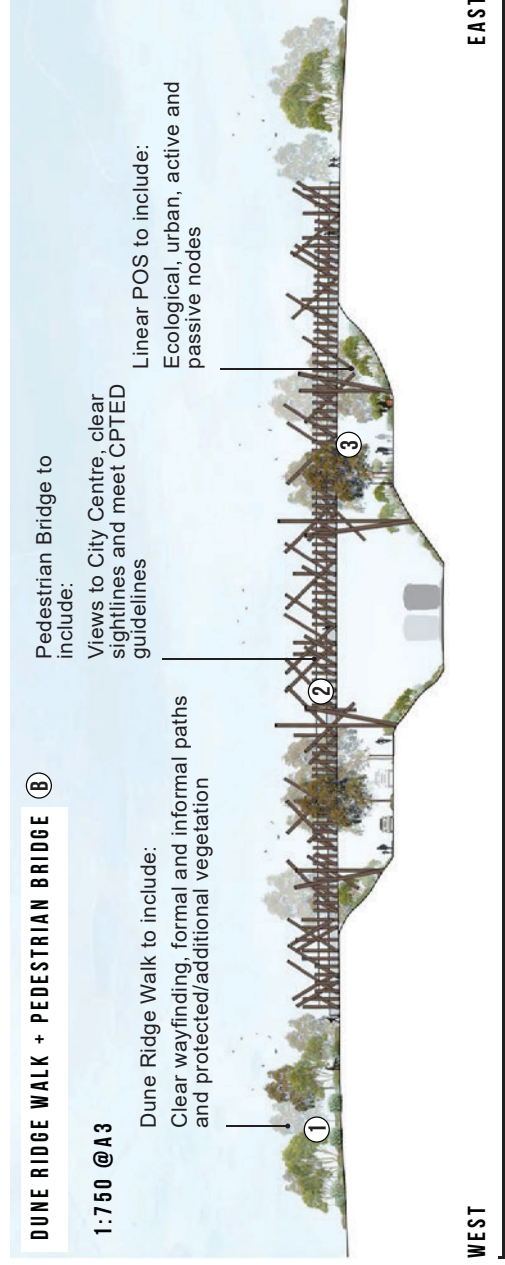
Dune Ridge Walk and Pedestrian Bridge - Indicative Section - UDLA
